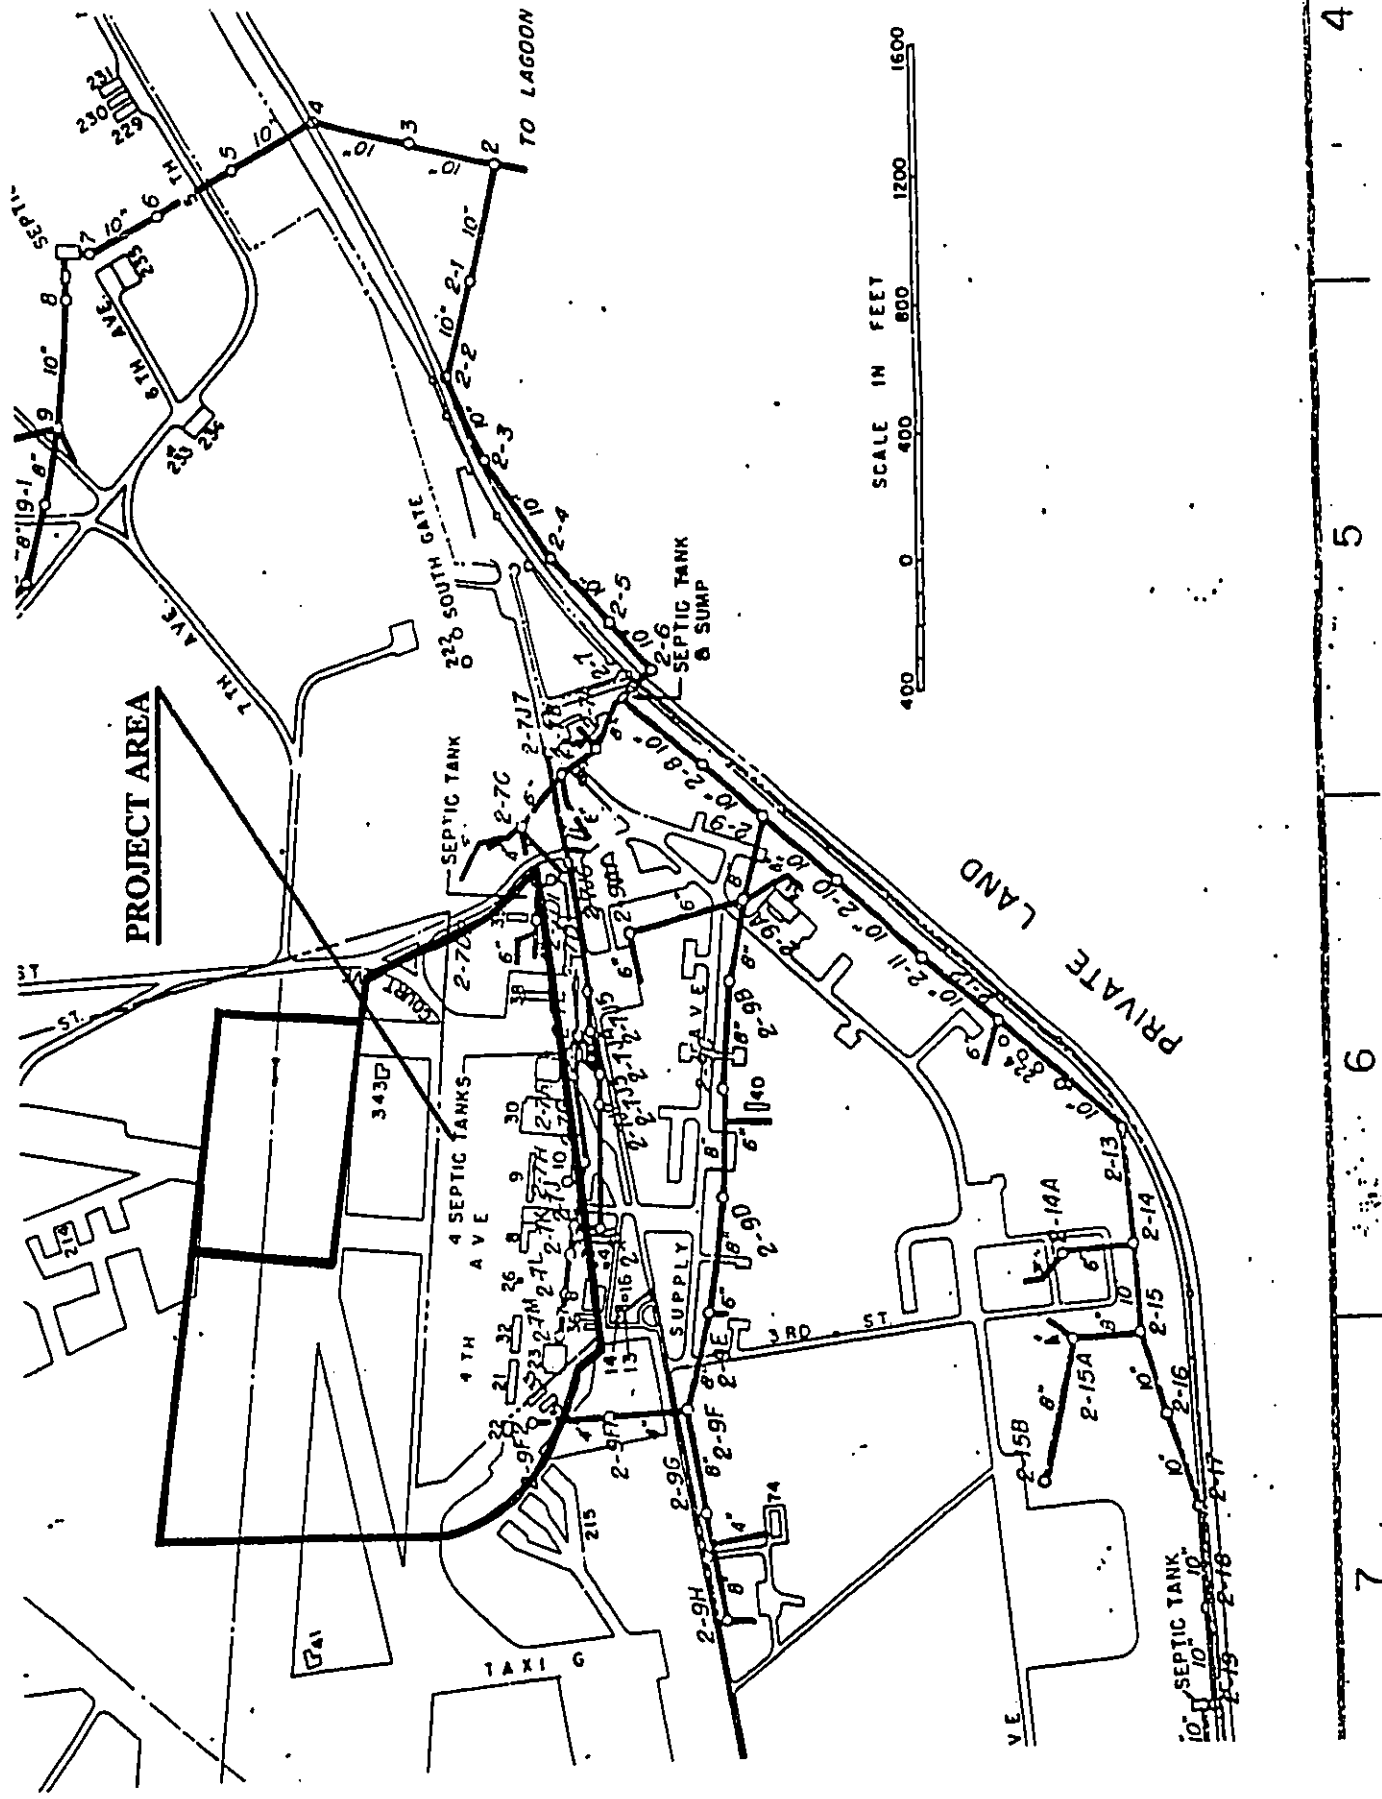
Portion of Air Station Plan with Project Boundary Overlay.
